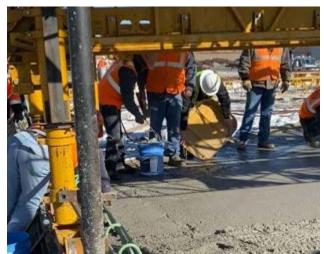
Applying Finishing Aid to the Concrete Surface
